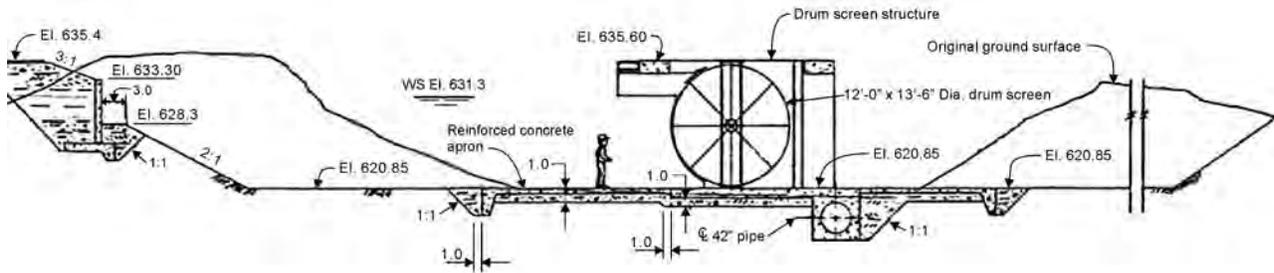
Elevation view of Chandler Canal Fish Screen, Washington.
